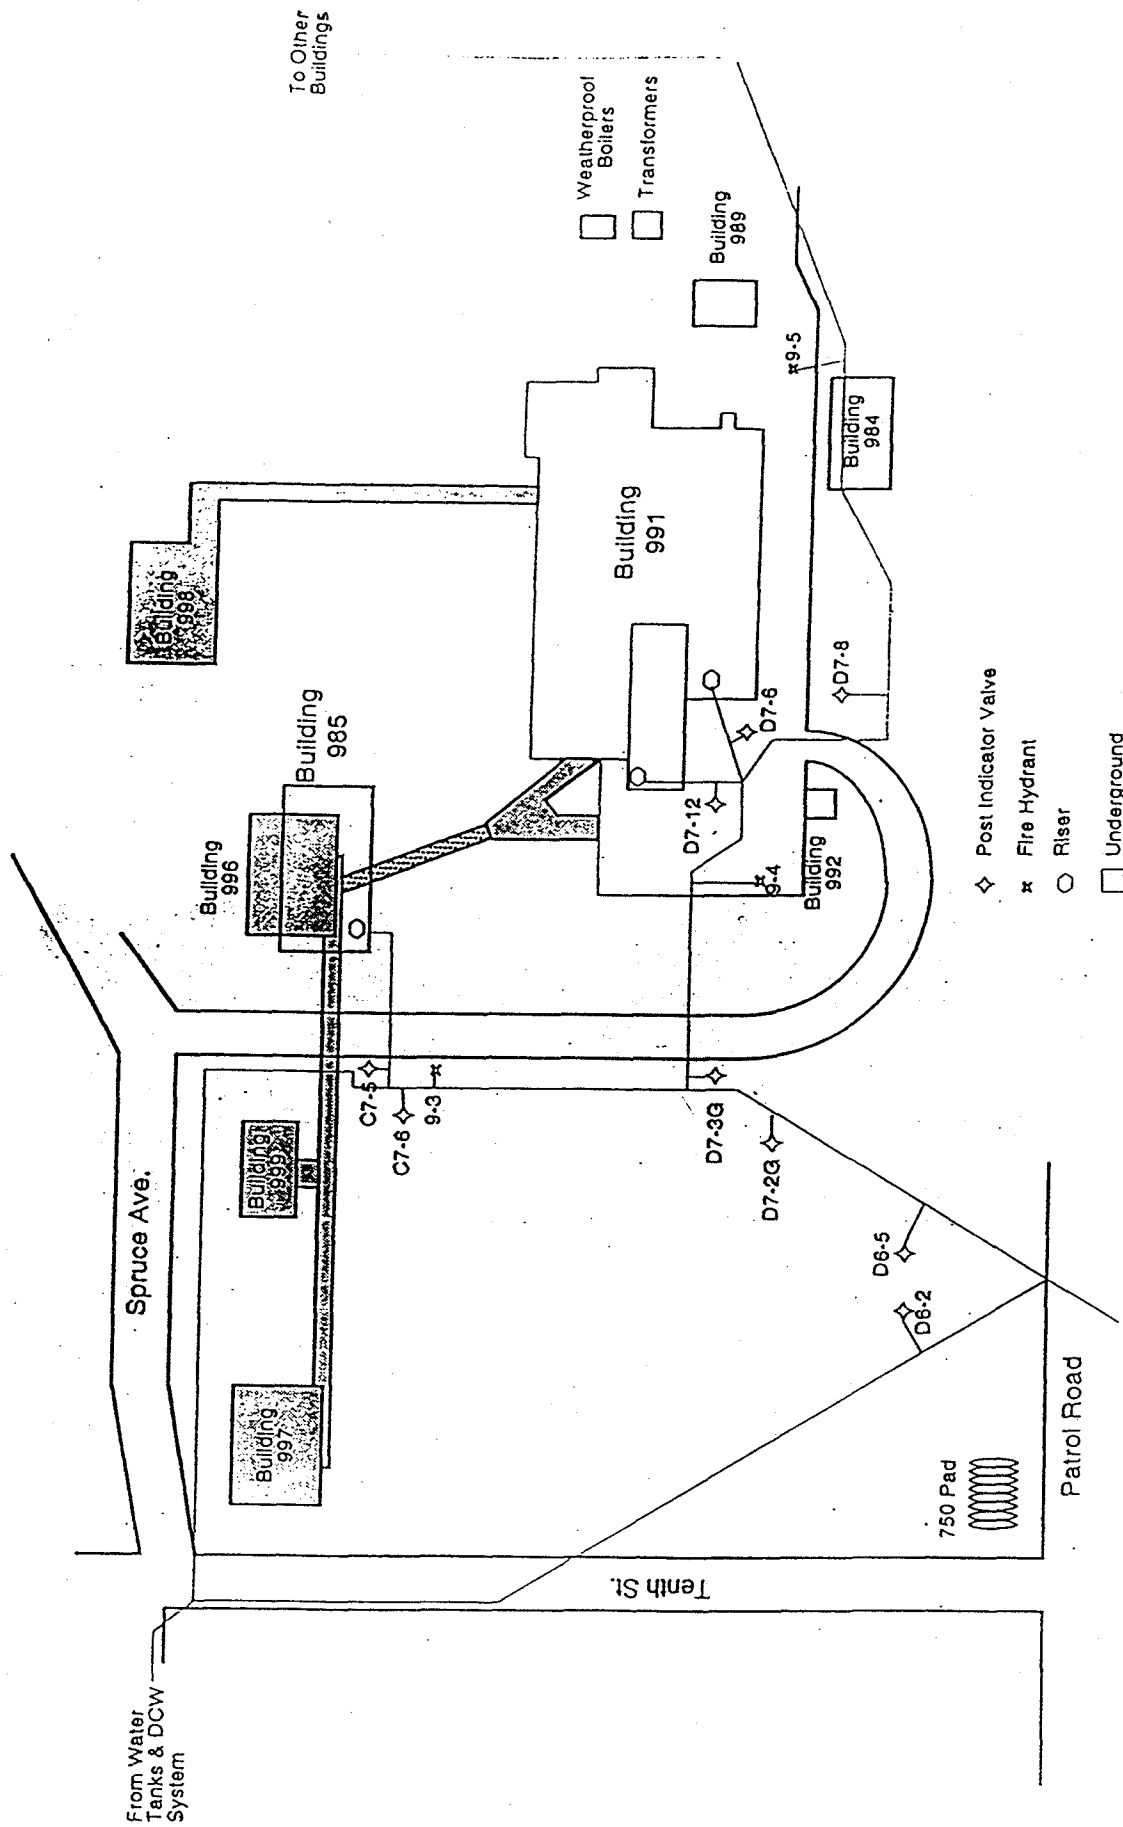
Building 991 Complex Fire Protection Water Loop
